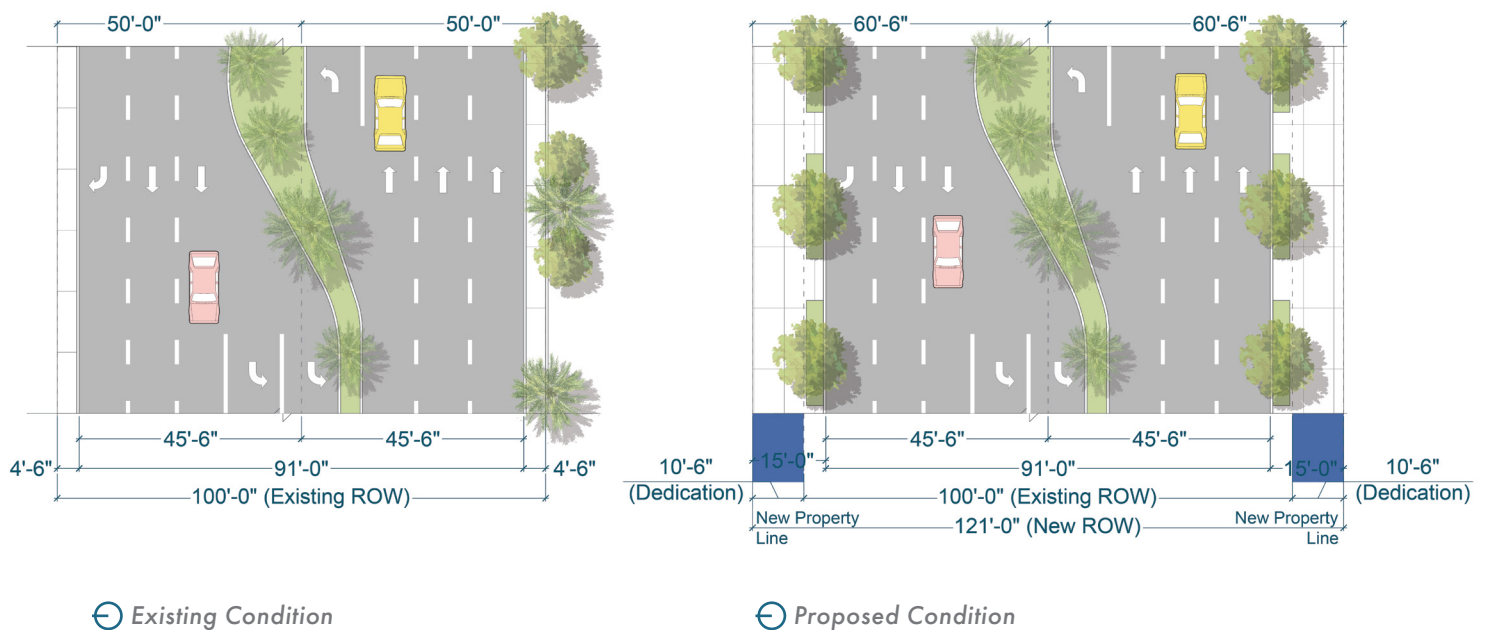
Slauson Avenue Right-of-Way Design (Sepulveda Boulevard to Transit Center Driveway)
